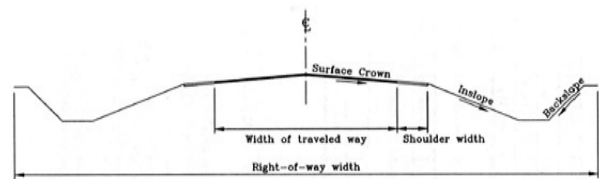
Typical Pavement Cross Section (SD Department of Transportation, 1996)
